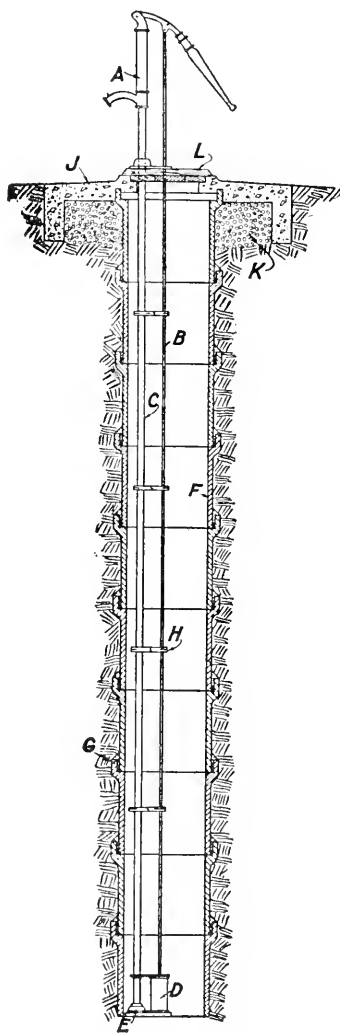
Section of a dug well with pump showing proper type of casing and protection about the top. Curbed with vitrified socket pipe. (a) Pump stand; (b) pump rod; (c) riser pipe; (d) cylinder; (e) check valve; (f) joints packed with grout; (g) joints packed with grout; (h) pump rod guides; (i) platform; (j) gravel foundation; (k) cross-planked cover.
